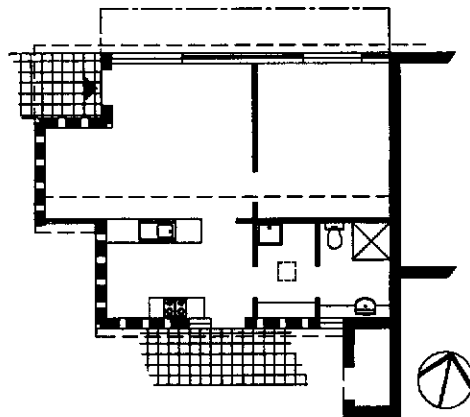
Plan of one bedroom dwelling (50m²)
